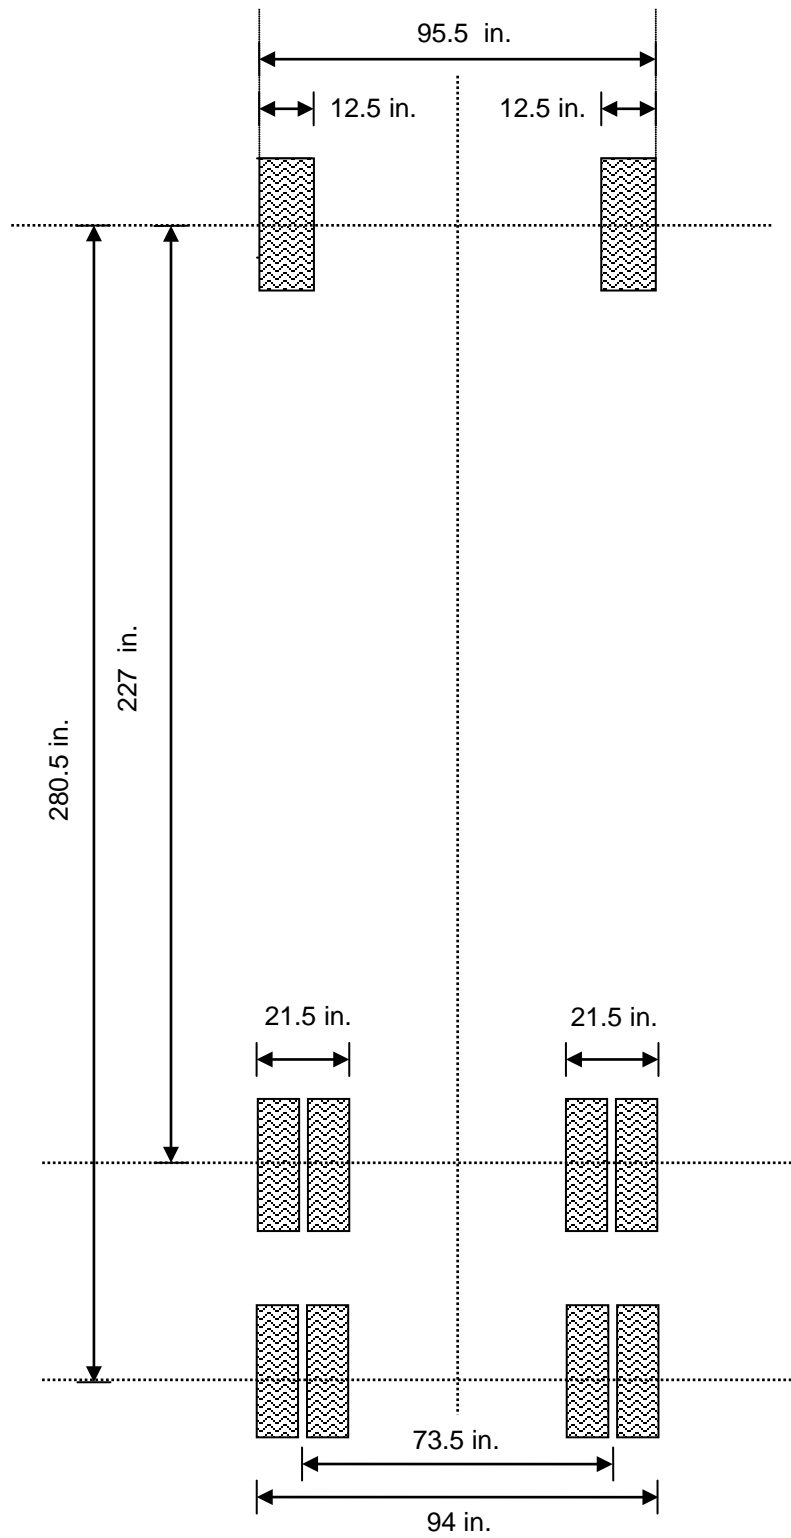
Footprint of ALDOT tool trailer truck (ST-6902)
